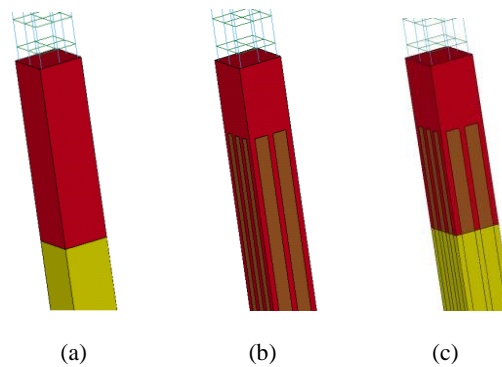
FRP strengthened RC column configurations, (a) FRP wrap, (b) FRP strips, and (c) combination FRP strips and wrap
